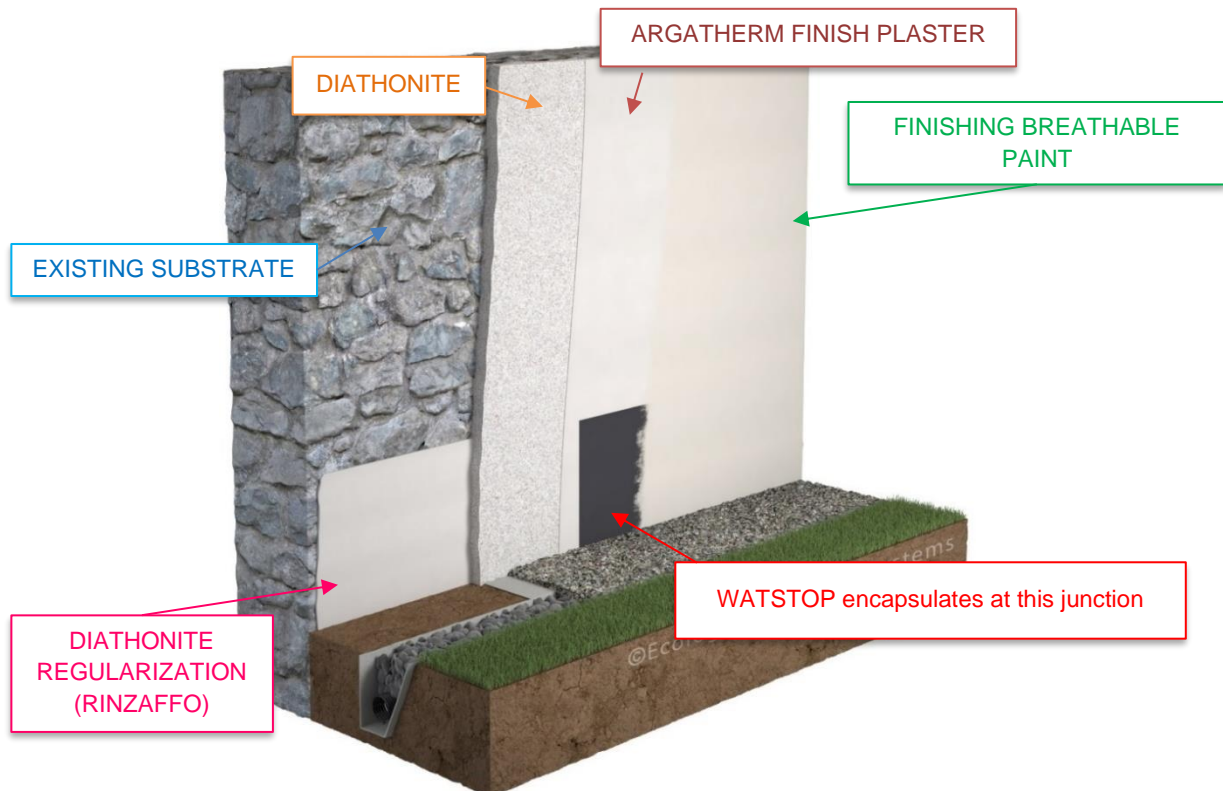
Application of WATstop between the wall and the external drain to prevent water ingress.
